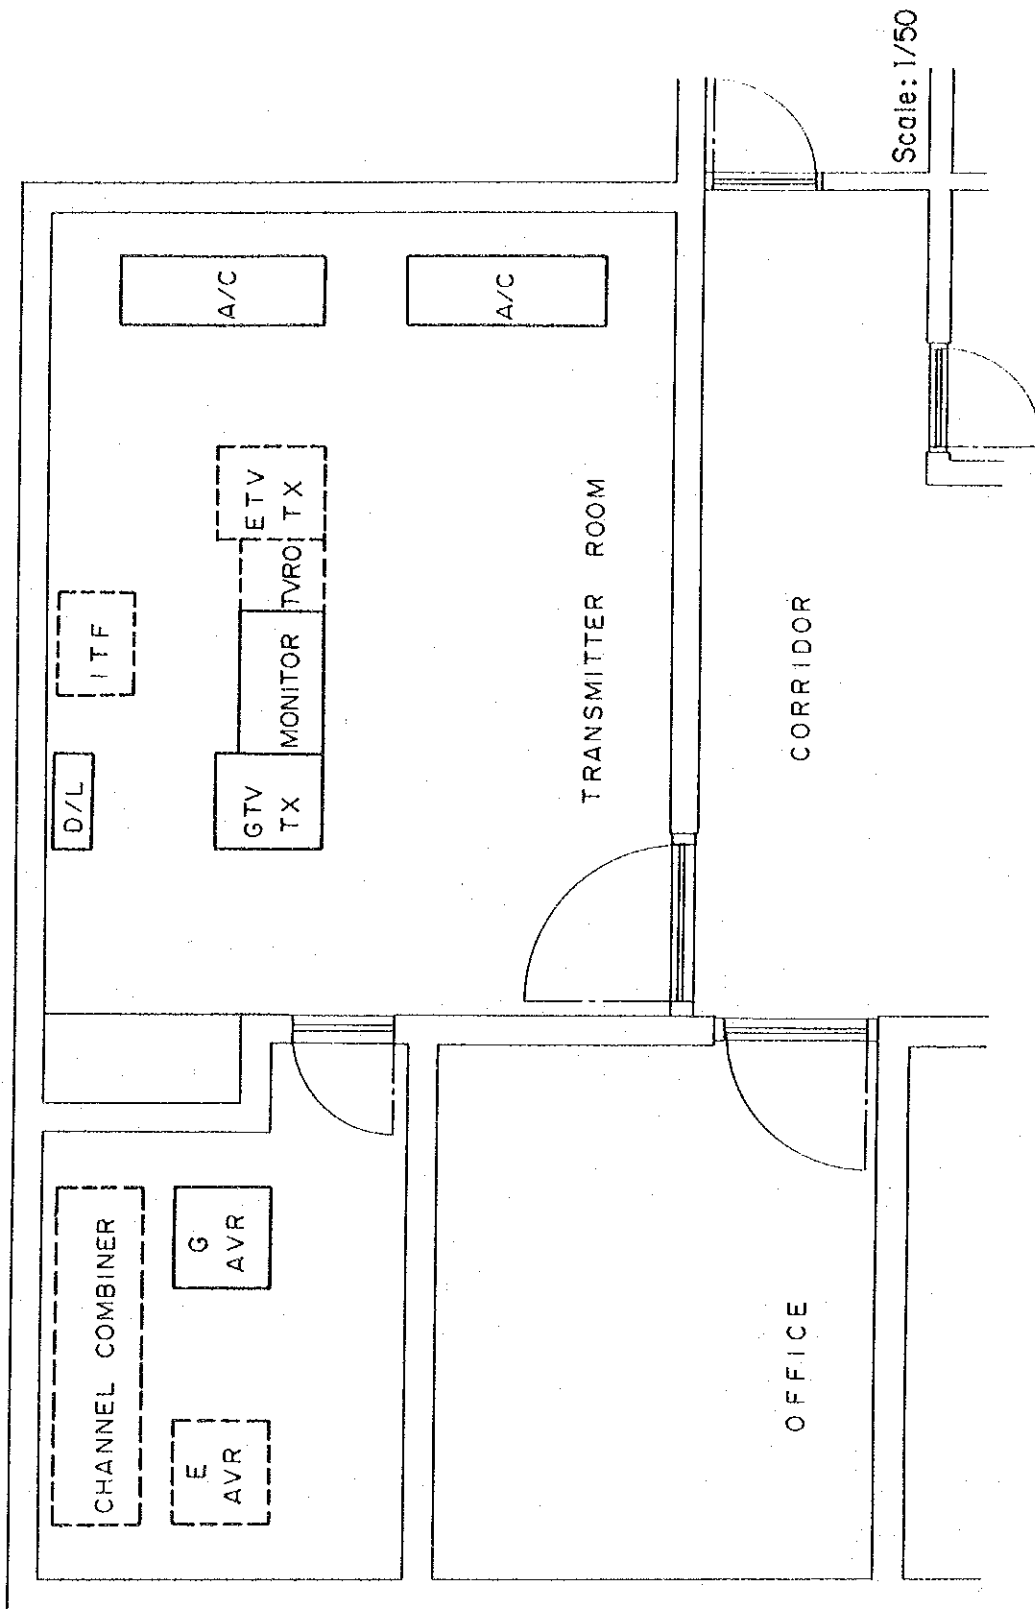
EQUIPMENT LAYOUT OF RBS BAHAWALNAGAR
